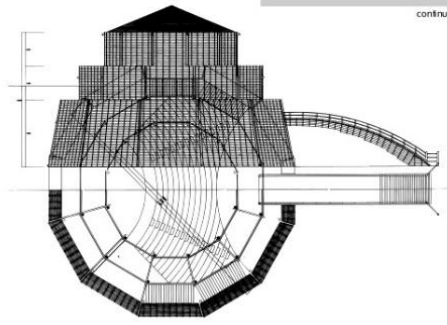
Karaza Theatre, Tadao Ando, 1987-88. Plan and elevation.
